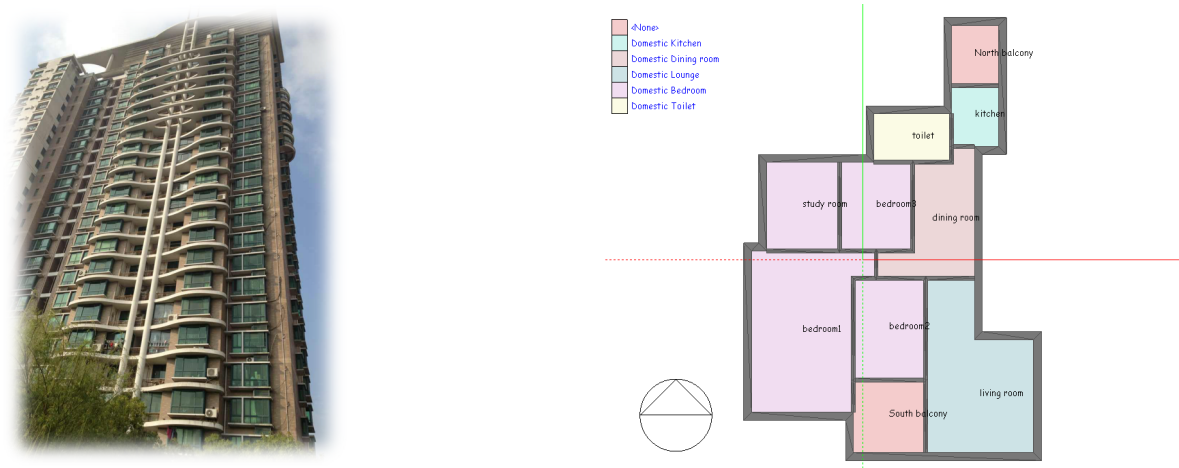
External appearance (left) and plan layout in DesignBuider (right) of sample 3a
